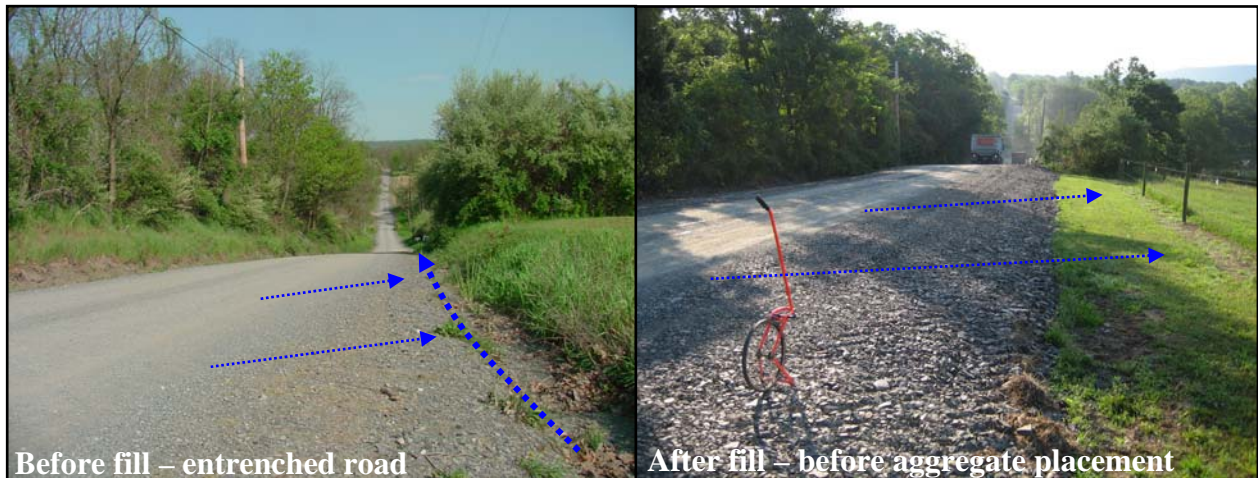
An example of “raising the road profile” on Diehl Road in Columbia County. Before, water was trapped in the sunken road and carried over 1,500 feet directly to a small stream in the distance. After, the road elevation has been raised and the ditch on the right has been eliminated. The additional fill material also provides the necessary cover to add crosspipes to drain the ditch on the left before it reaches the stream. Blue arrows indicate runoff flow. This photo was taken just above the test section.
